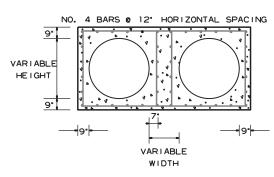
DETAIL FOR DRIVEWAY TURNOUTS (COLLECTORS)
